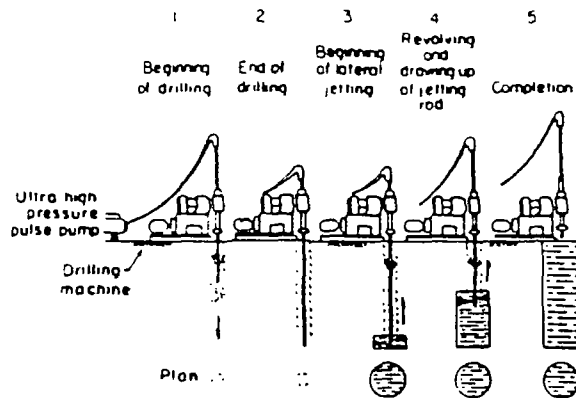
Mixed-in-Place Columns Made by Jet Grouting
